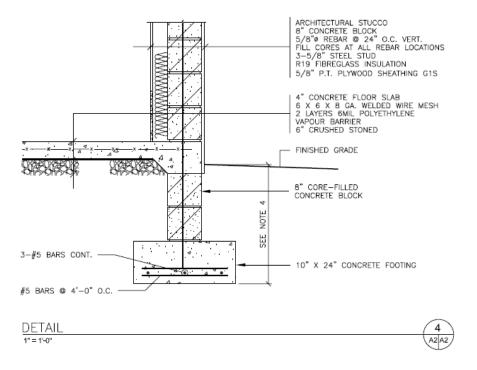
; TYPICAL EQUIPMENT BUILDING STRUCTURAL DESIGN - DETAILED OVERVIEW OF KEY STRUCTURAL DESIGN AREAS
